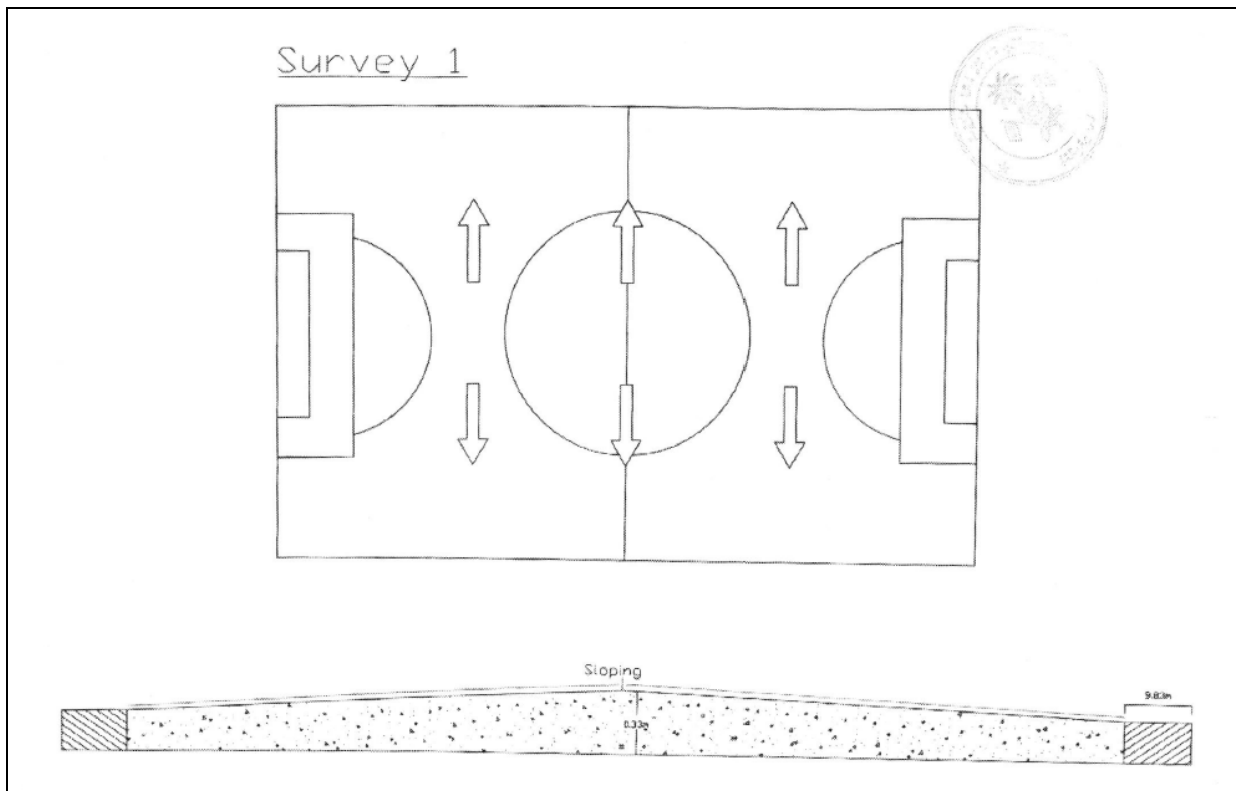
Engineering drawing showing the ground levelling details of the playground.
